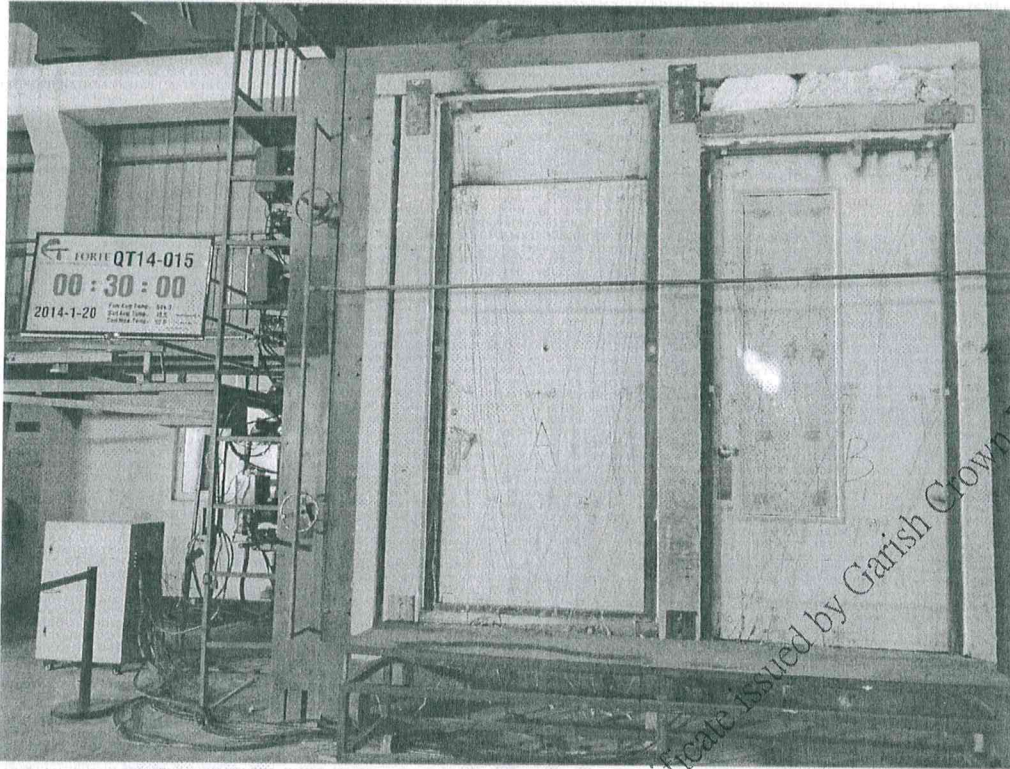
Unexposed surface of the specimens at 30 minute of test.
